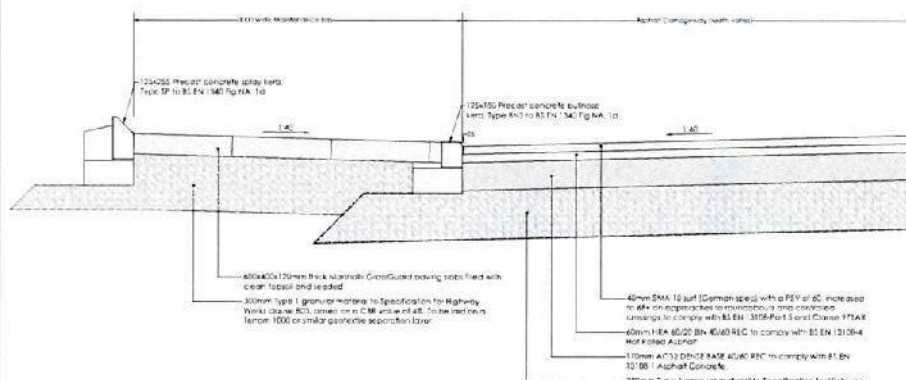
SECTION THROUGH ASPHALT CARRIAGEWAY (60 PSV)
